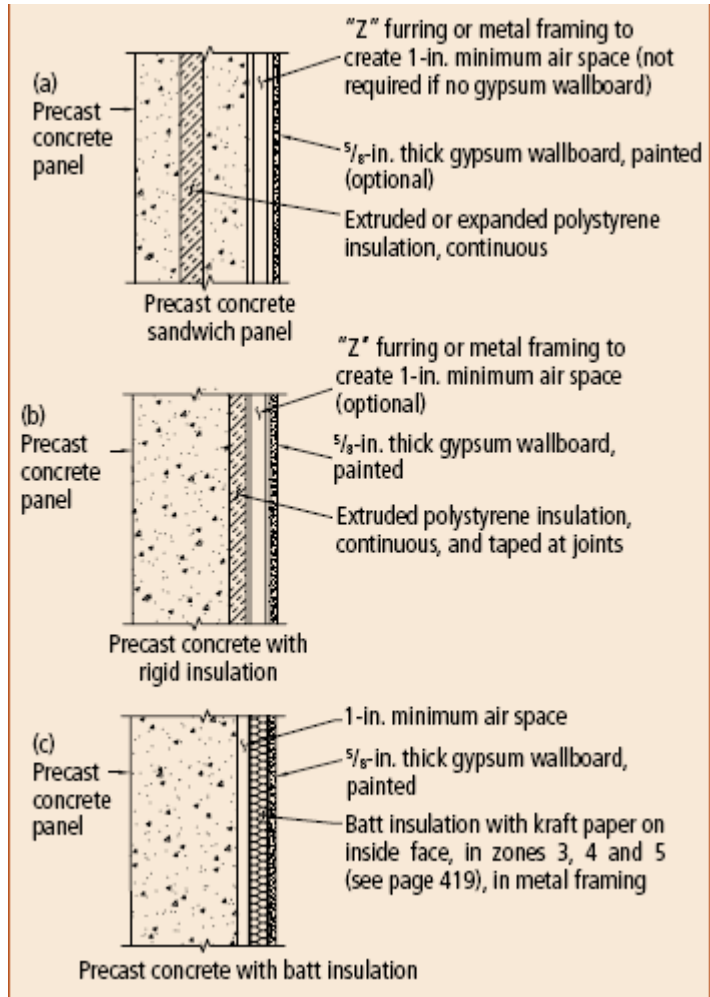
Typical cross-section of cladding panels (from Precast/Prestressed 2007, by permission)
